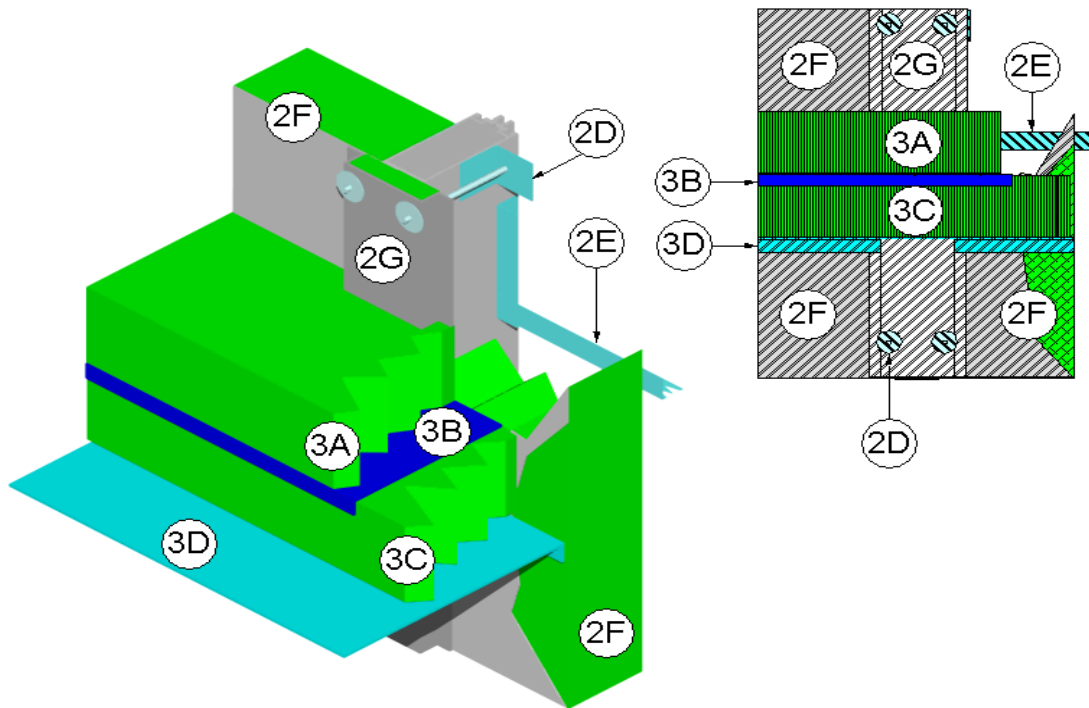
Perimeter Joint Protection Isometric and Elevation
